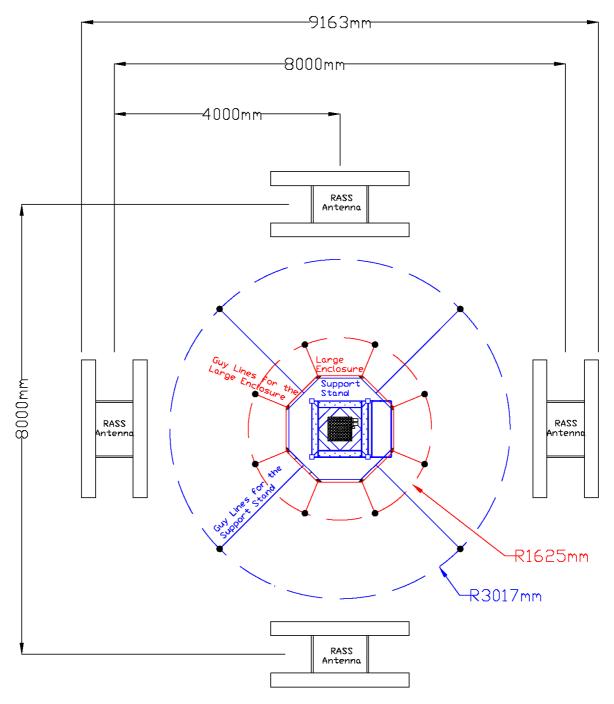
Overall dimension of SFAS/windRASS system with large enclosure (red) or support stand (blue)
